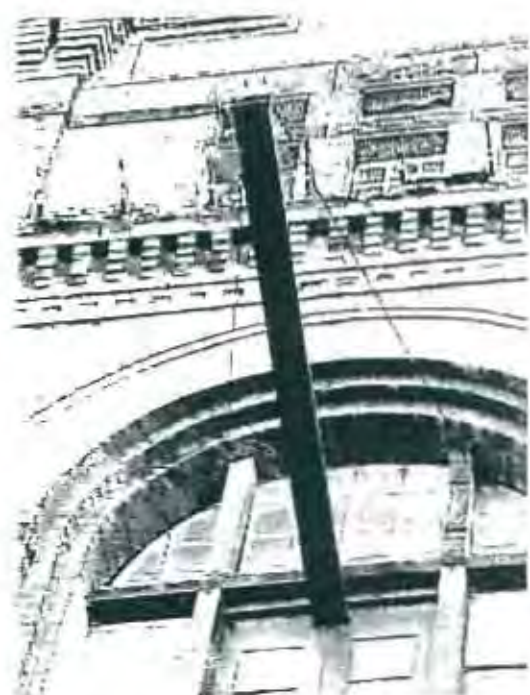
/18: The building after the 1984 conversion (repaired and cleaned) (detail of front façade)
